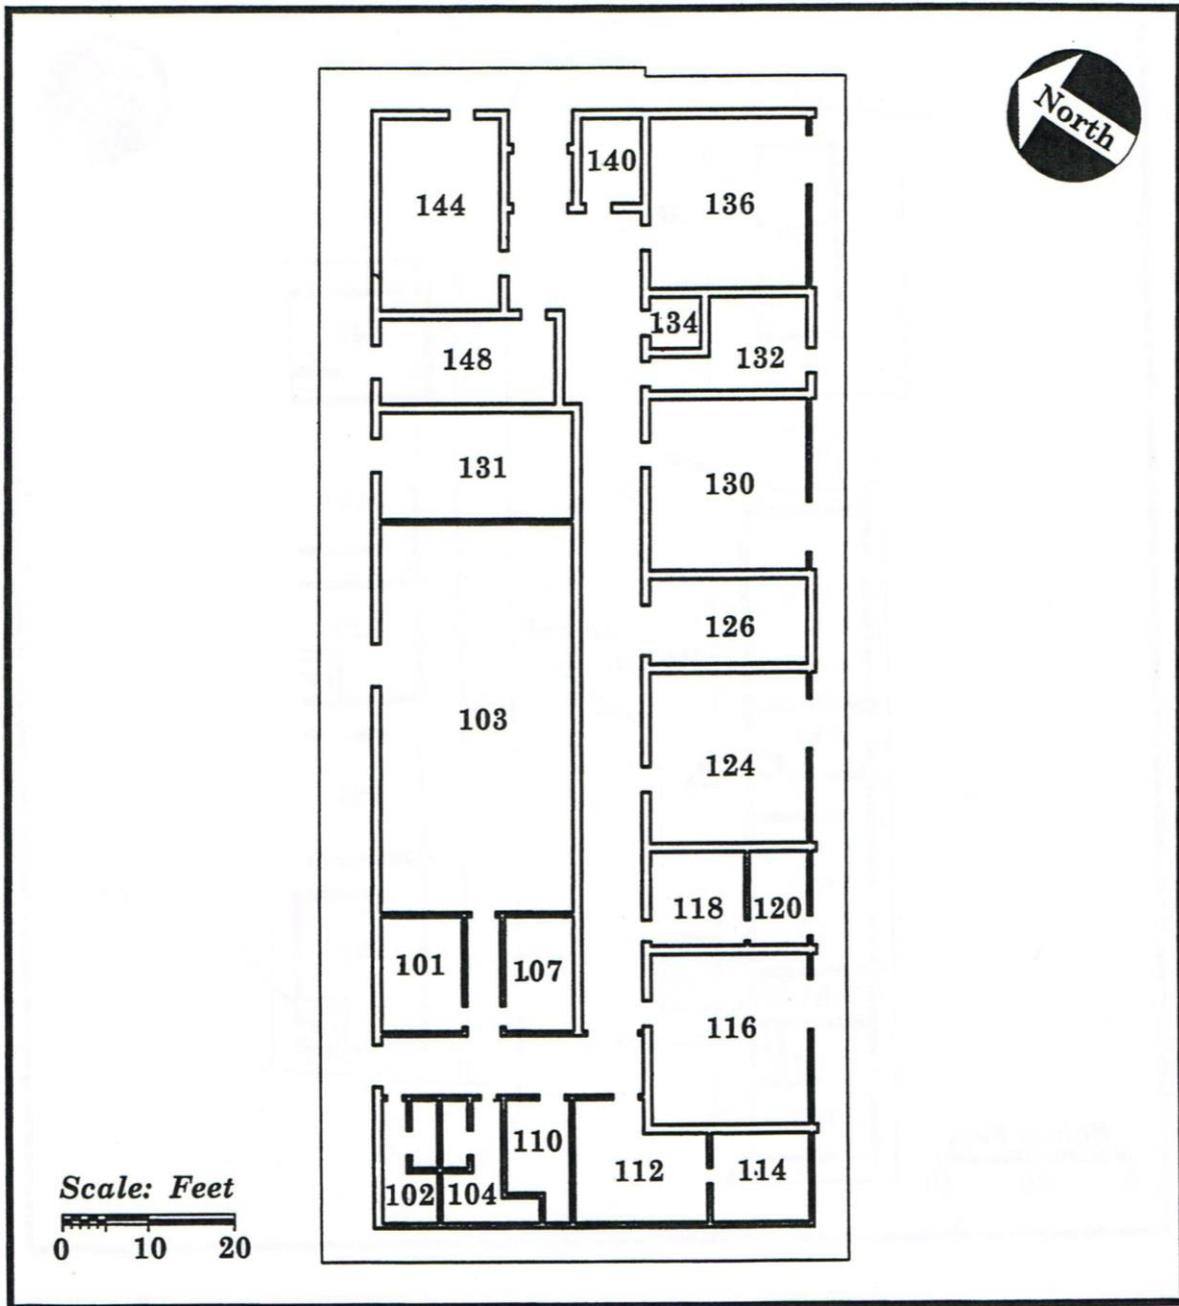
Building 805, Facility Floor Plan, 1997. LLNL Archives. (Figure A-1)
